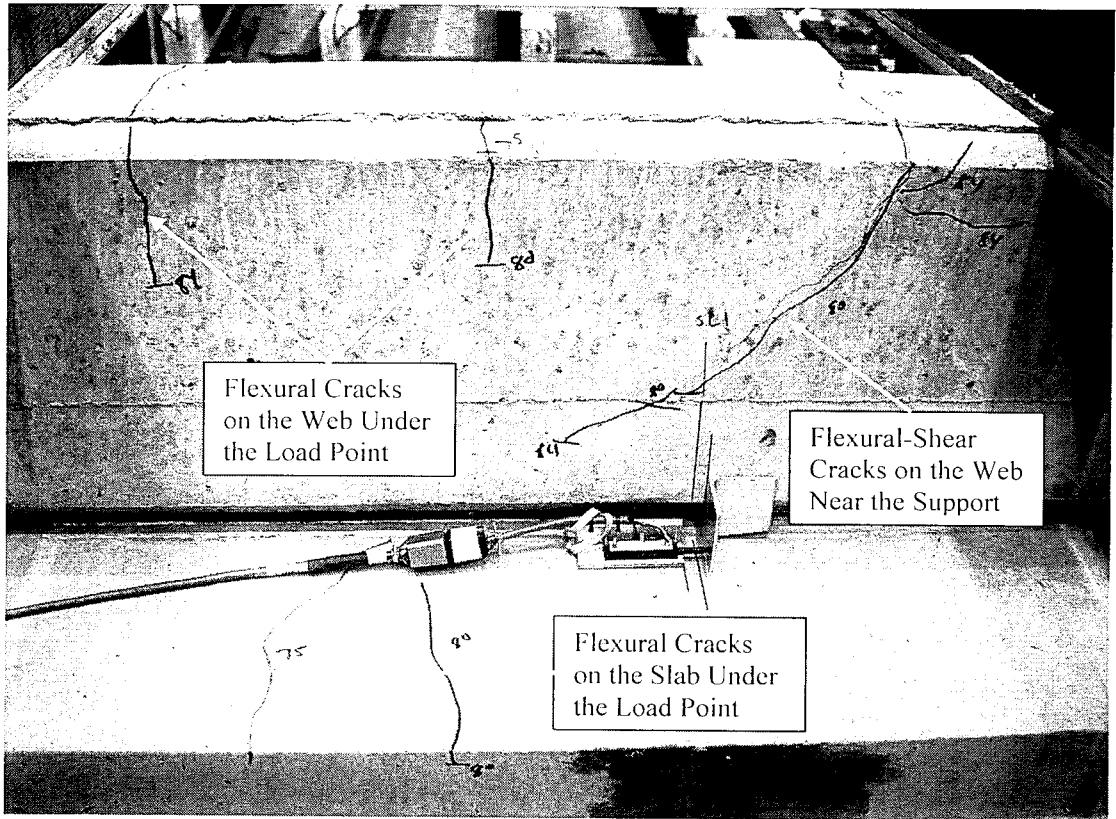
Cracks on West End of Specimen at Failure [Specimen 6R7]
